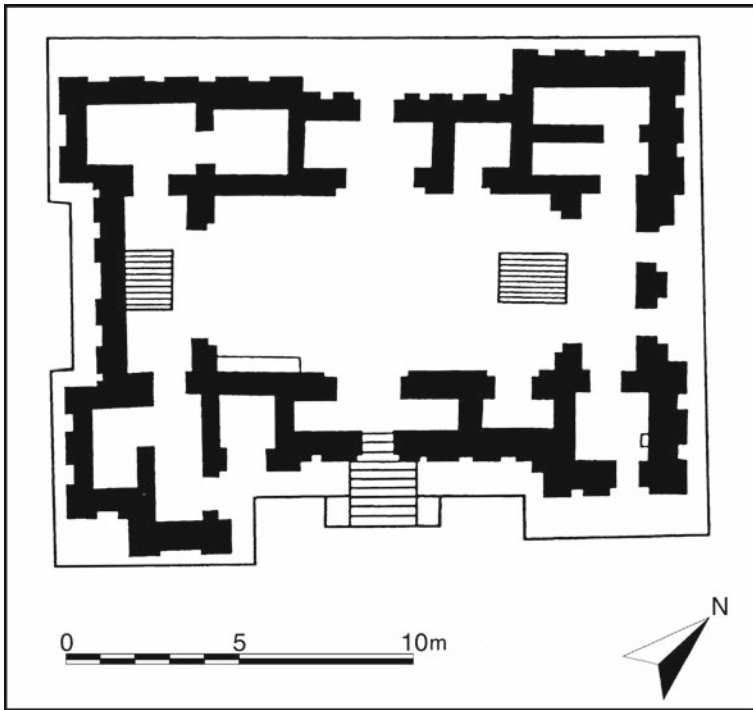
Eridu, south Iraq. Cultic building, temple VII
